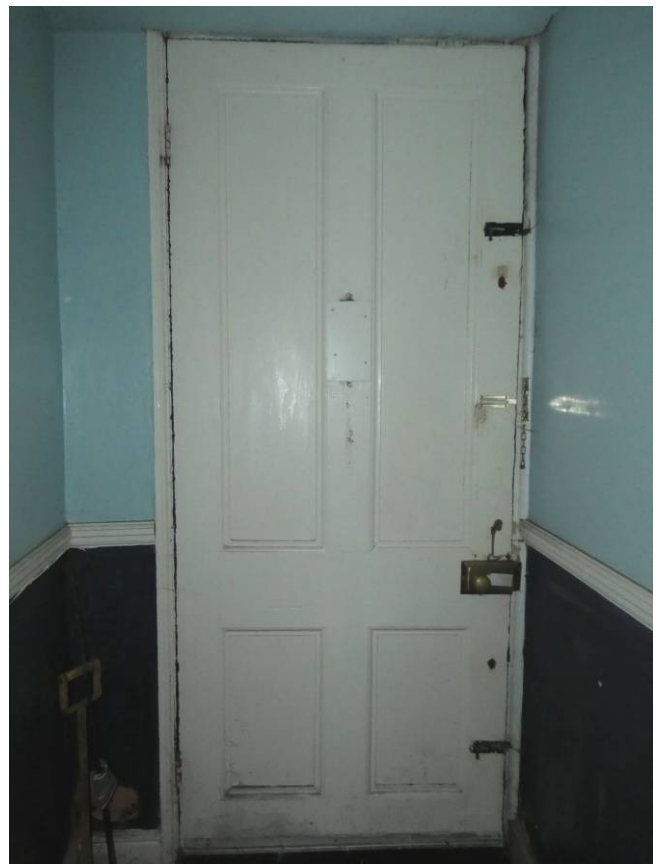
Room GF1, inside face of front door, looking NW (photo 1/814).
